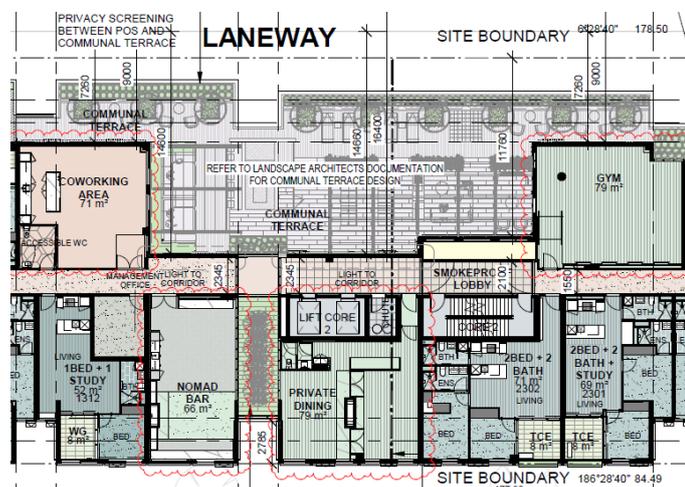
Communal spaces in PLN16/0922 – 1-57 Wellington Street & 71-77 Victoria Parade, Collingwood
